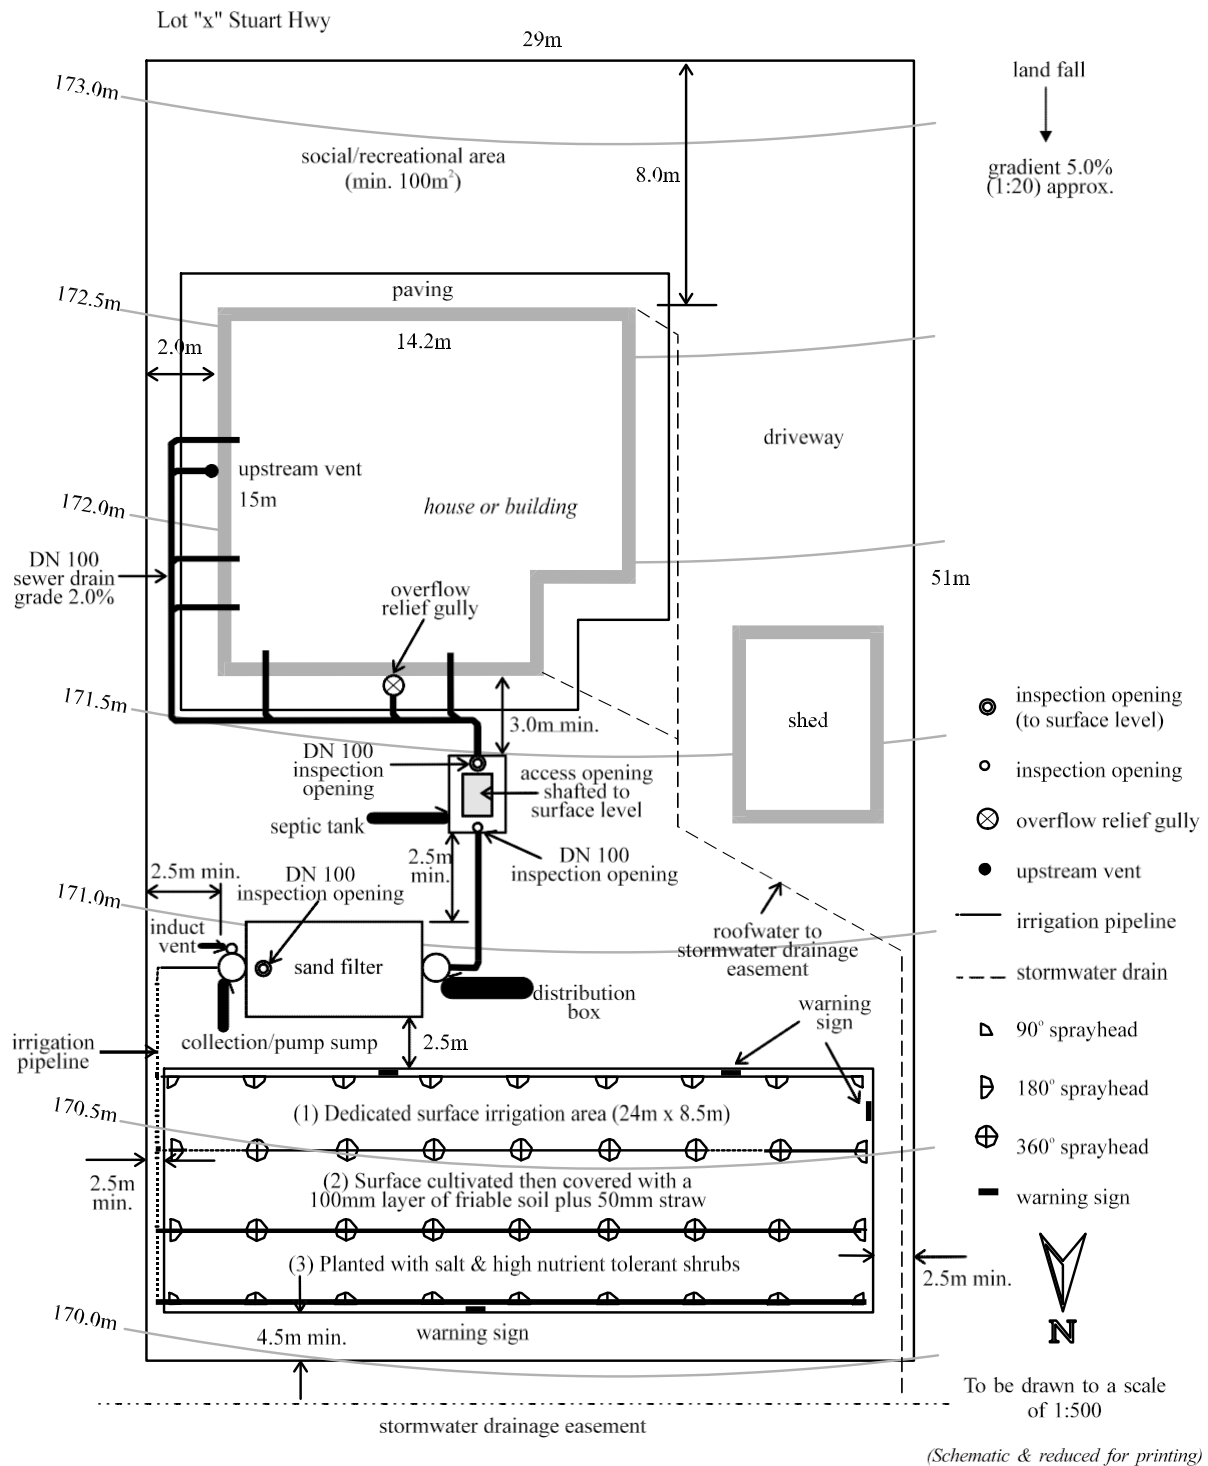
TYPICAL SITE LAYOUT PLAN
